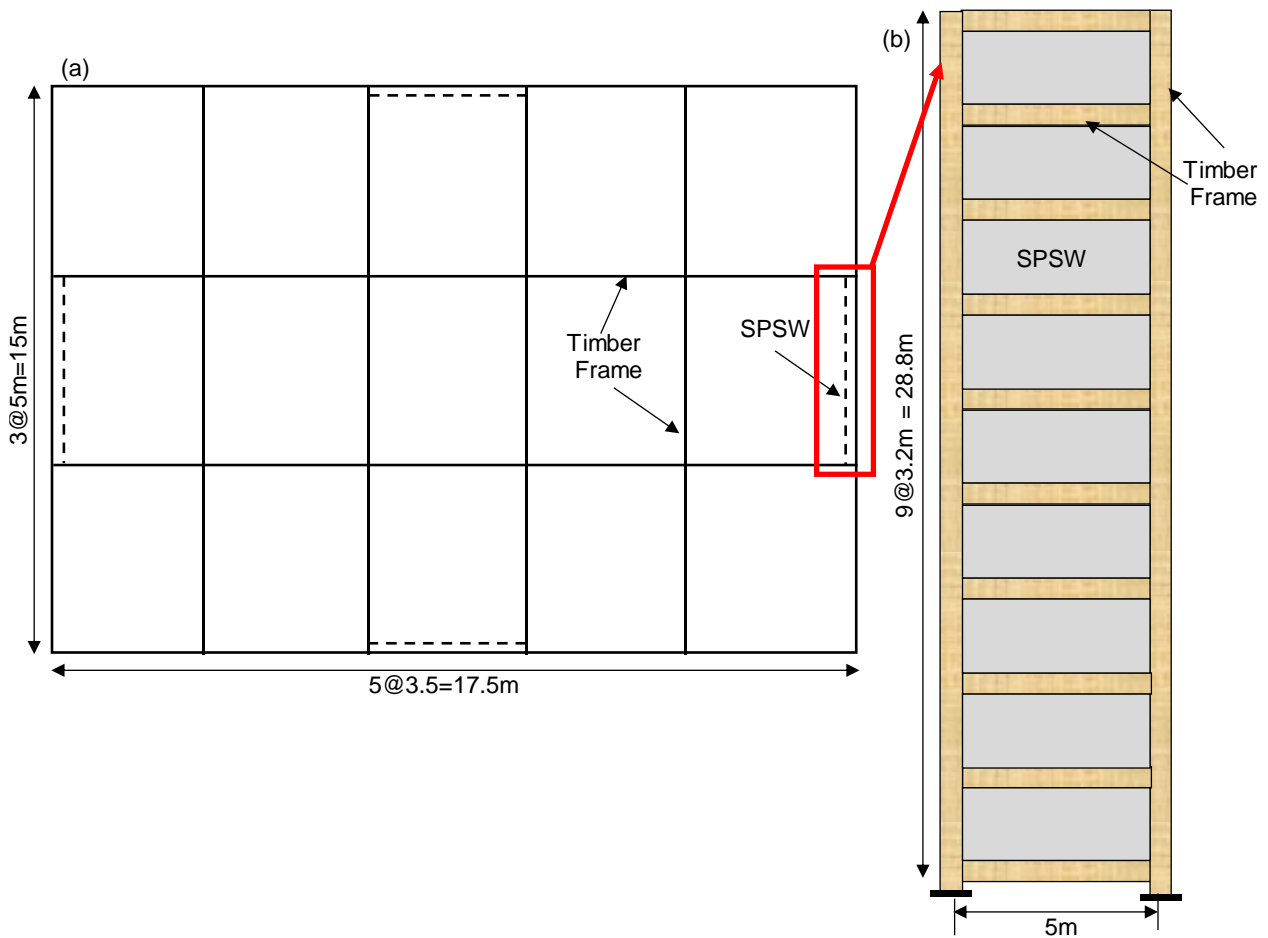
(a) Plan and (b) Elevation of the SPSW-timber frame building [9 storied shown only]
